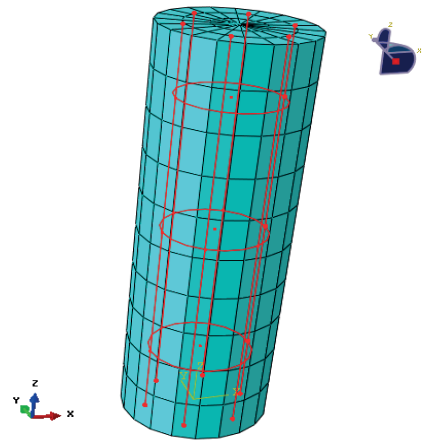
Meshing of longitudinal and transverse reinforcements in the concrete mass
